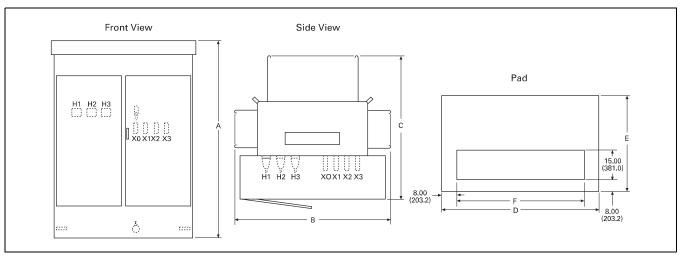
Pad-Mounted Transformer (3000-5000 kVA)—Dimensions in Inches (mm)
